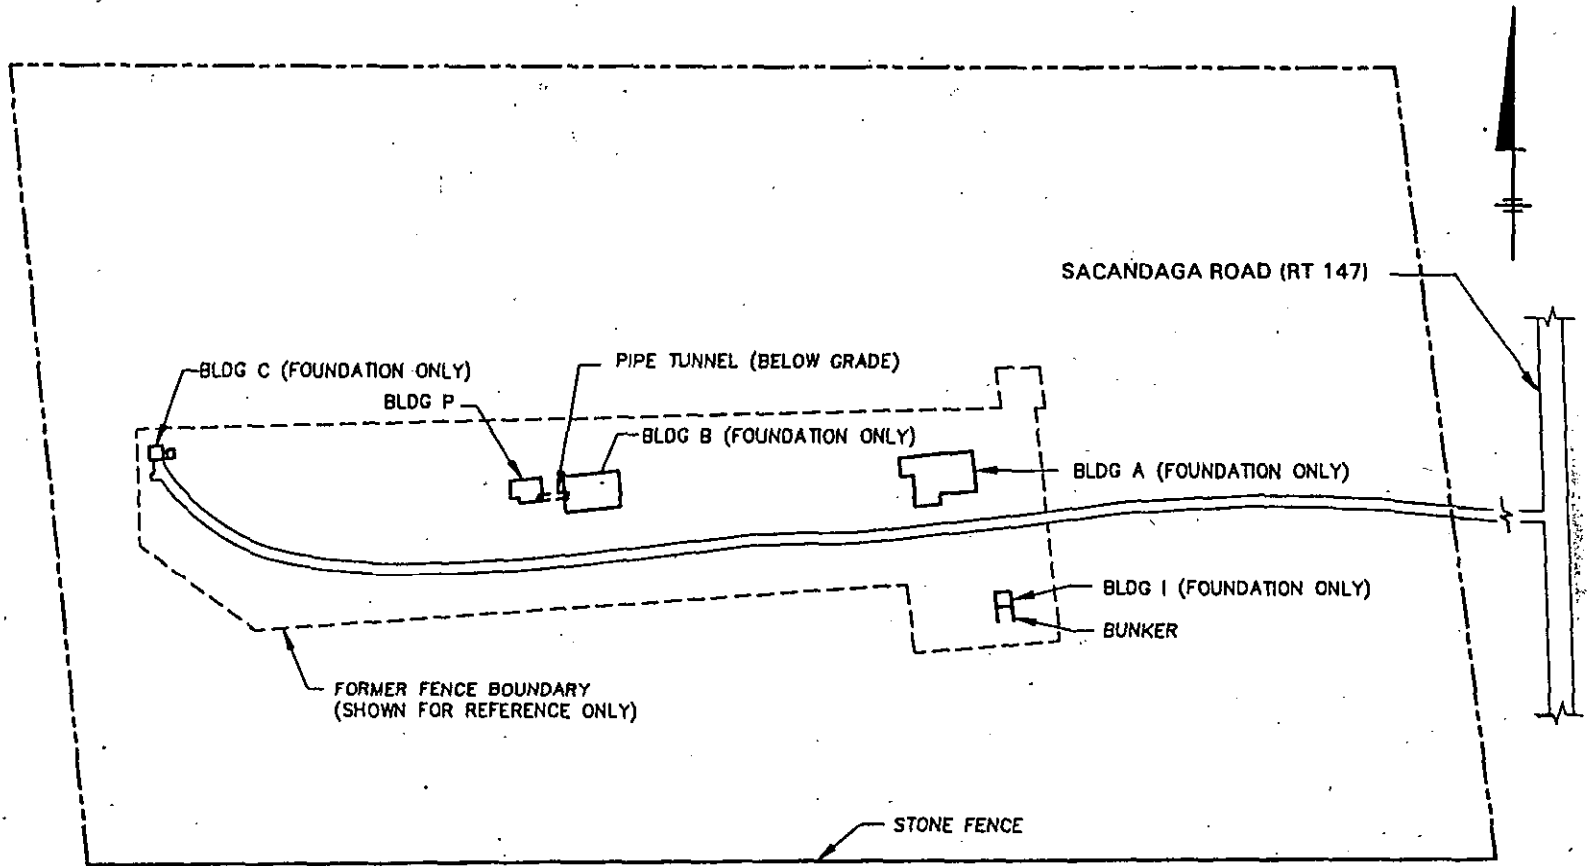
SACANDAGA SITE - FOUNDATIONS AND STRUCTURES PRIOR TO REMEDIAL ACTIVITIES
